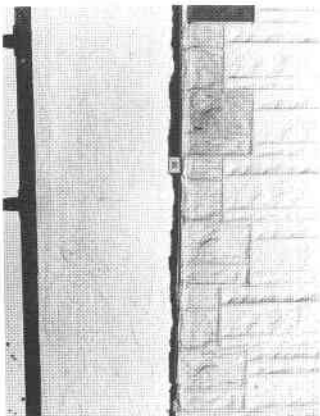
Wall crack in two-story stone and wood house.
